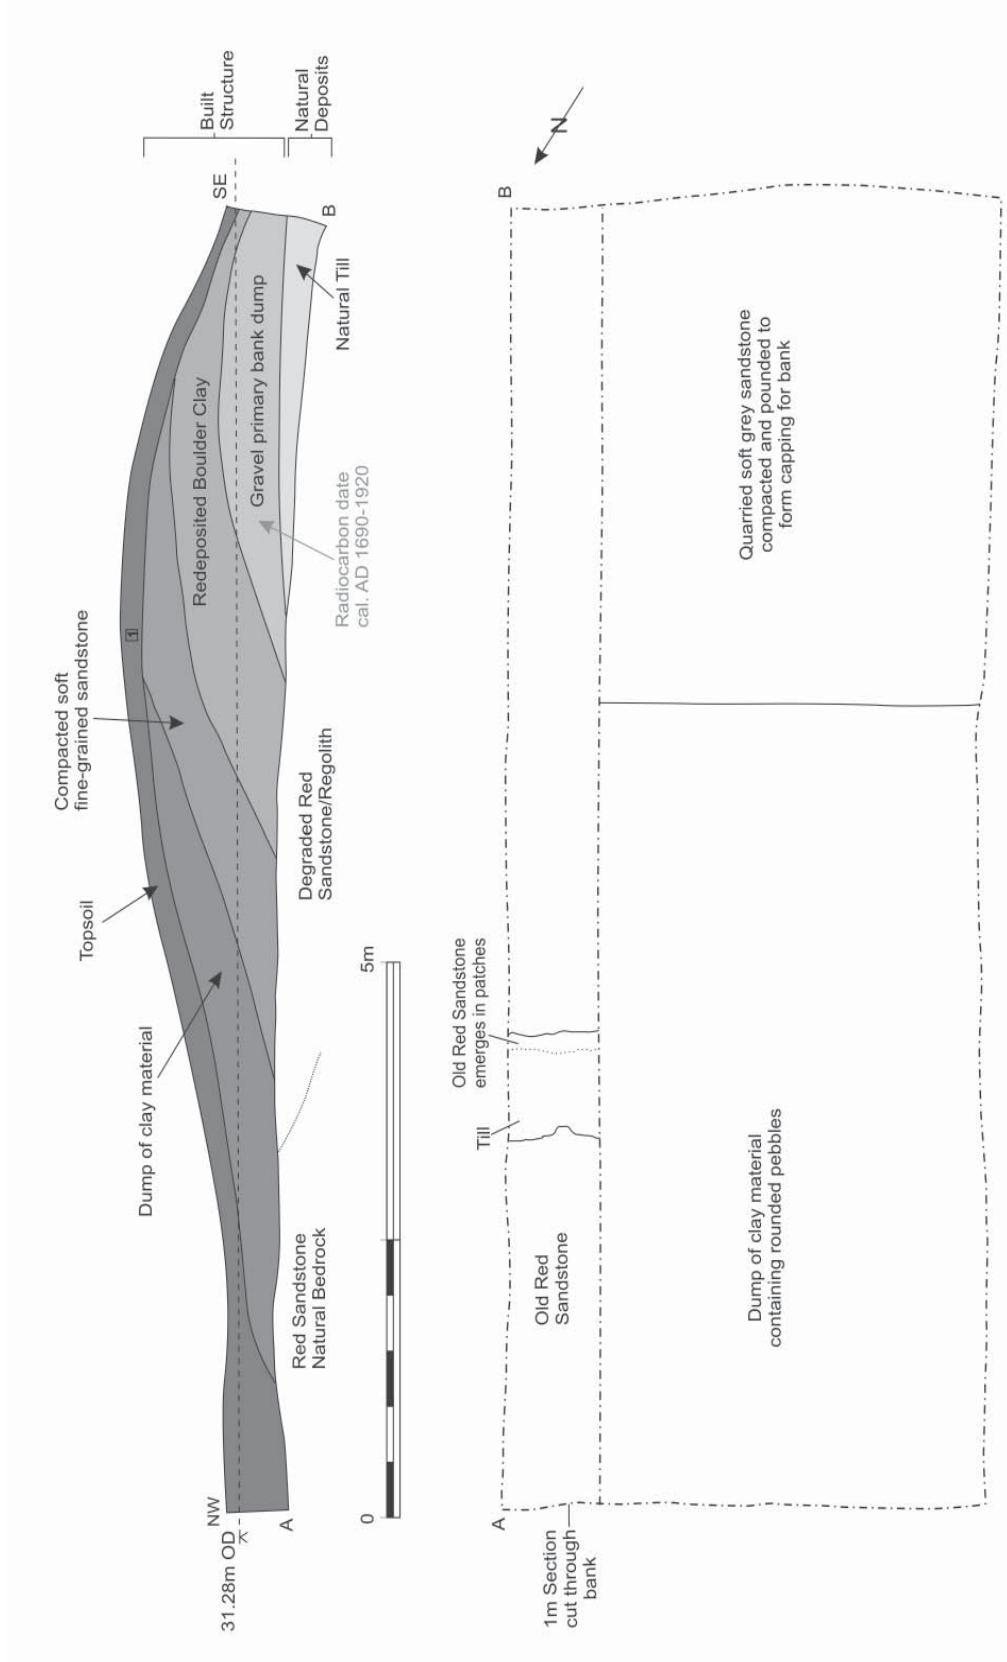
Plan of trench and section of the bank showing constructional sequence.
